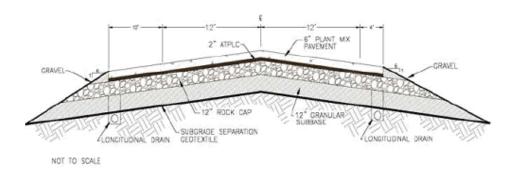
Flexible pavement rural interstate, typical section for Idaho
